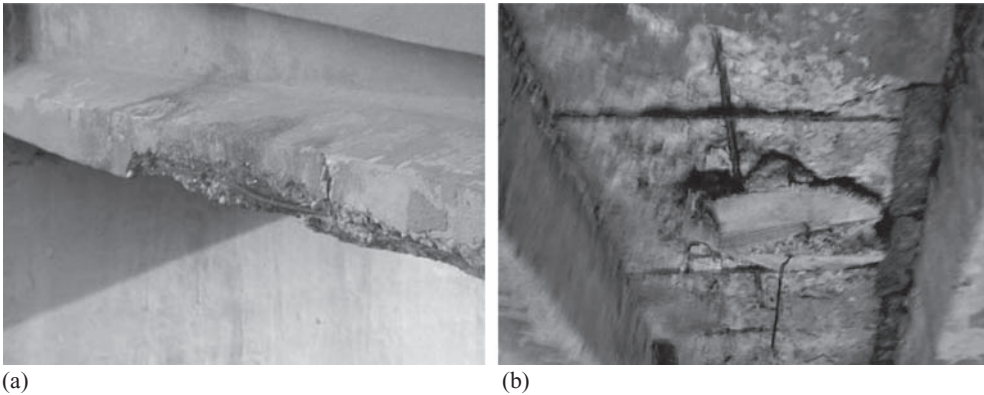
Reinforced concrete floor slab deterioration: (a) Expelled concrete cover, (b) Rusty steel bars.
